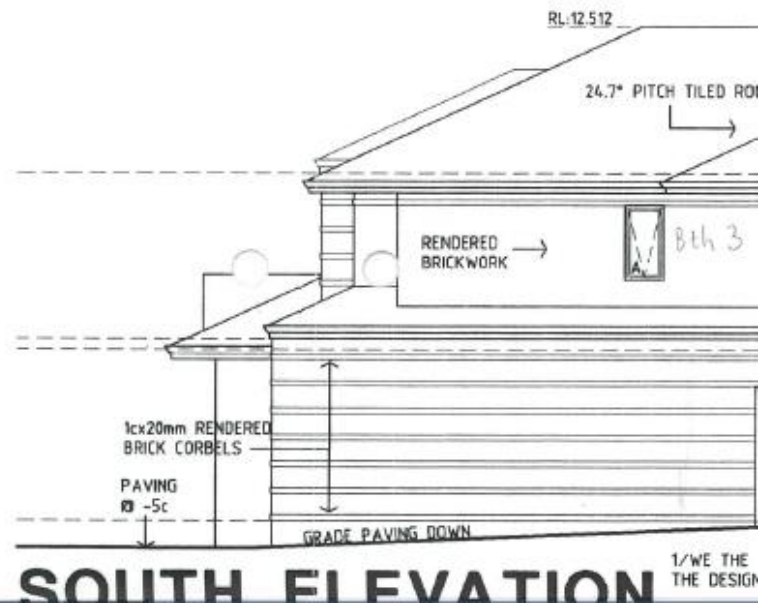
Front half of southern elevation of building at No. 51 Ranelagh Crescent.
